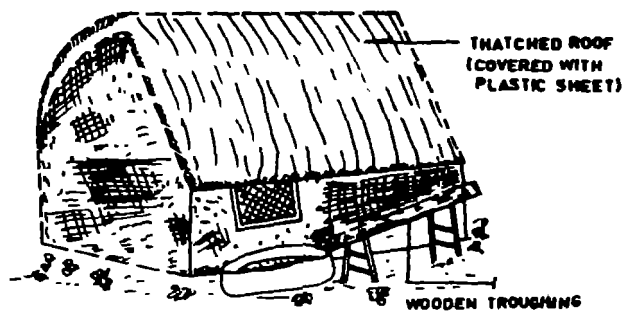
ALTERNATIVES TO GUTTERING-GLIDES AND LOW LEVEL TROUGHING
